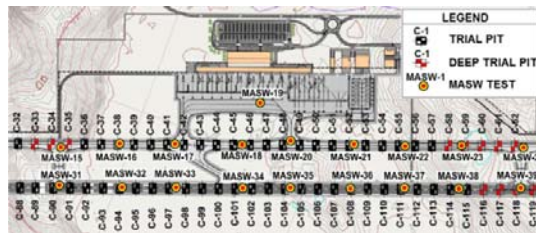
MASW test and trial pits location plan, in the central zone of the runway No. 16/34.
